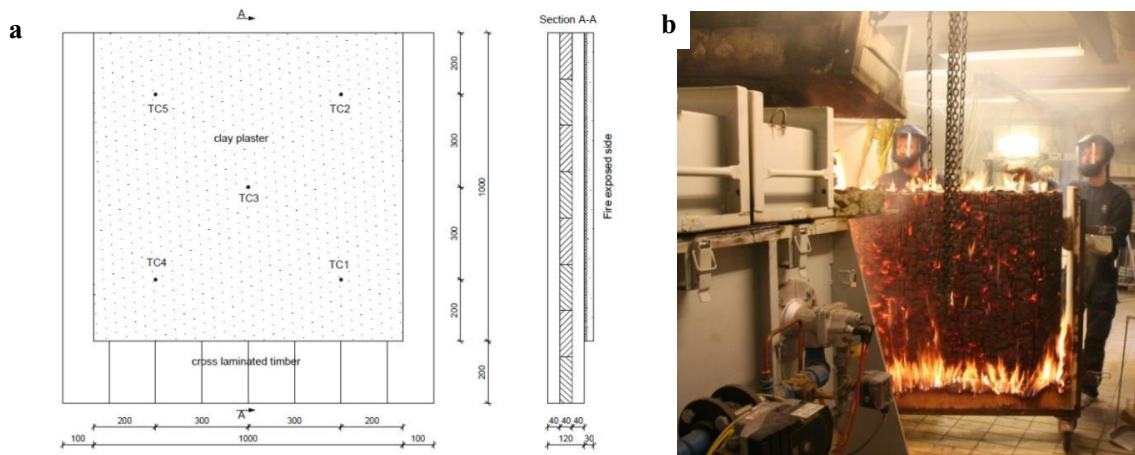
(a) Plan and cross-section of the test specimen; (b) Test specimen after the test.
